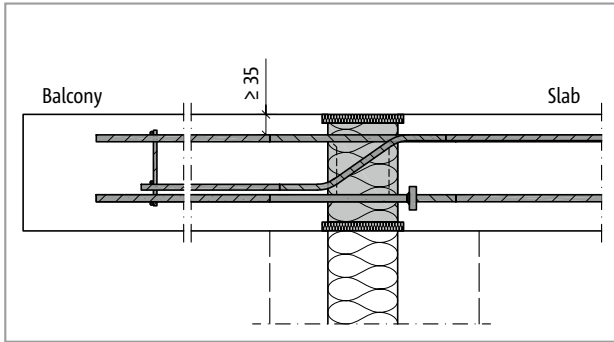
Schöck Isokorb® XT type C-CV35: Connection with non-load-bearing cavity wall masonry
